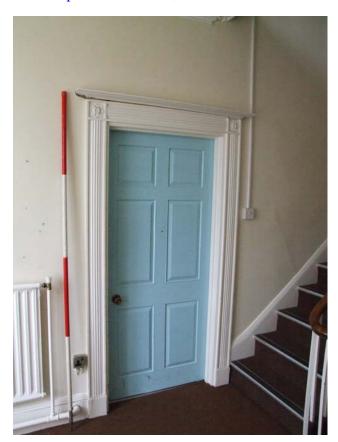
Original 1st floor door and surround (Scale 2-metres)
